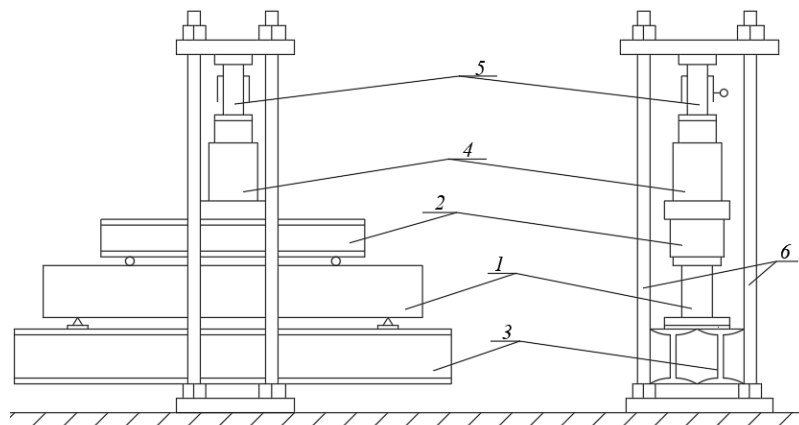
Test bench: 1 – the beam being tested; 2 – traverse; 3 – the lower load beam (I-beams); 4 – jack; 5 – sample dynamometer; 6 – racks
